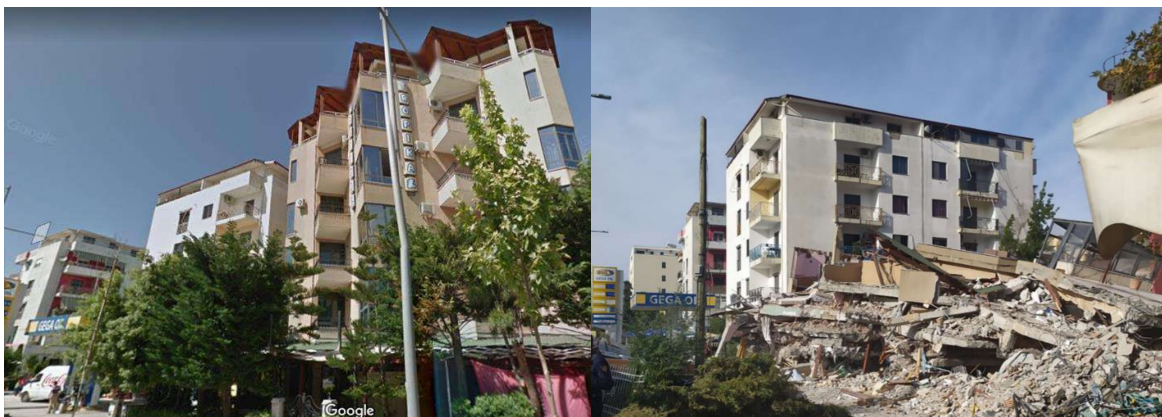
Damages in Buildings with more than 5 storeys with RC frame and infill walls (Hotel Tropikal, Durres) (before and after earthquake)
